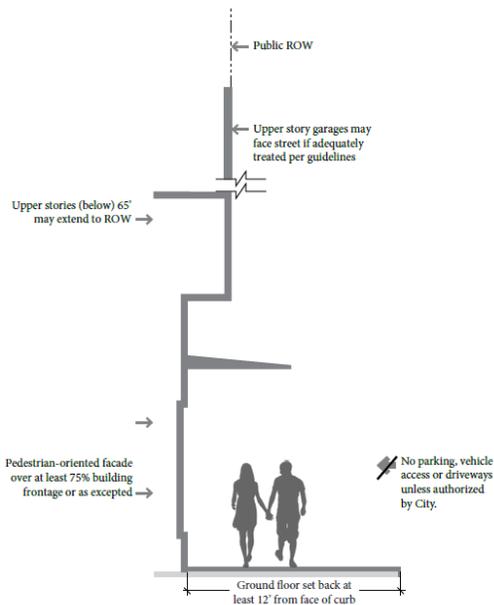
D.2: Summary of requirements for building façades facing a Type B Pedestrian Oriented Street (this diagram is for illustrative purposes only. See Section 18.120.220.D for stated requirements).
